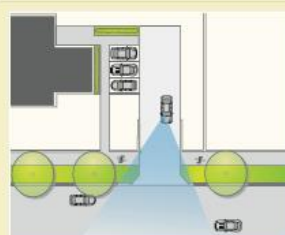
High street walls should be limited to the minimum necessary and be visually permeable.
